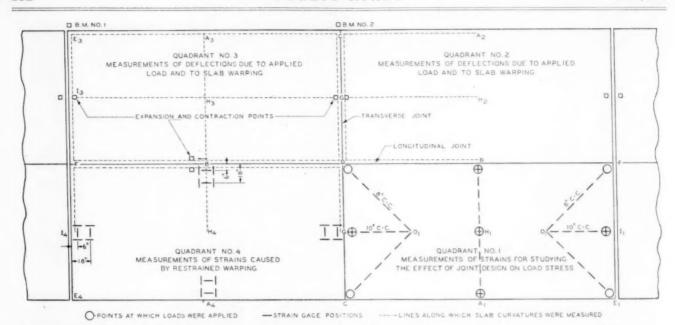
PLAN OF A 20 BY 40-FOOT TEST SECTION SHOWING THE POSITIONS OF THE APPLIED LOADS AND OF THE MEASURING INSTRUMENTS FOR THE STUDY OF JOINT BEHAVIOR. MEASUREMENTS OF DEFLECTIONS IN QUADRANTS 2 AND 3 WERE MADE WITH LOADS APPLIED TO QUADRANT 3 AT LOAD POSITIONS CORRESPONDING TO THOSE INDICATED BY CIRCLES IN QUADRANT 1.
